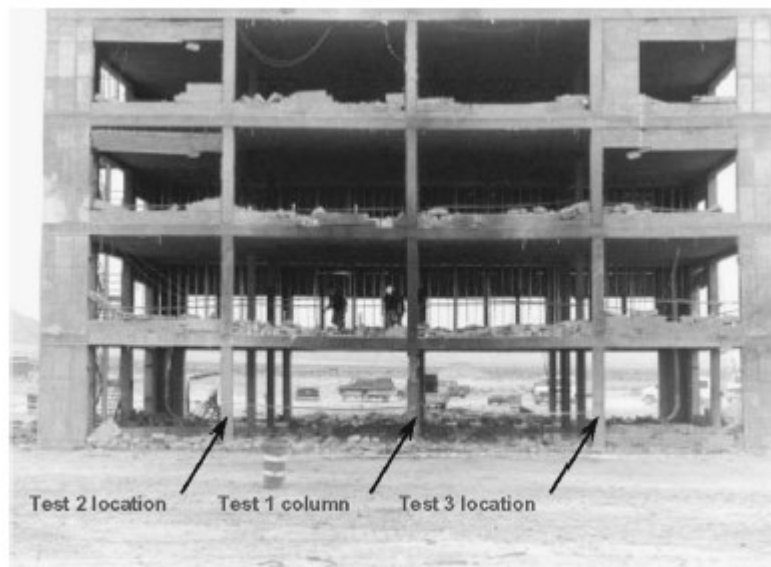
Full-scale blast testing of buildings (Dusenberry, 2010)
